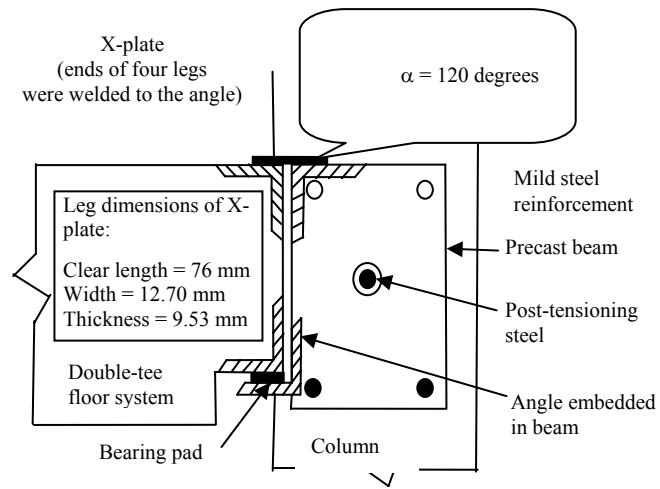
Illustration of connection between floor system and hybrid frame through X-plate (not to scale)
